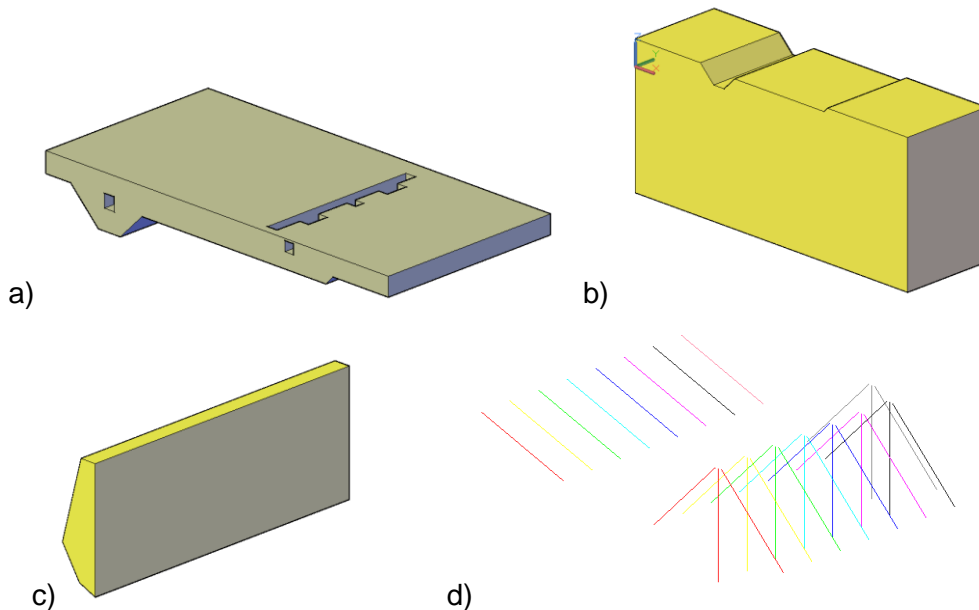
Representation of the FEM model elements: a) foundation joint of the additional hydropower plant; b) rock mass; c) injection curtain; d) drainage boreholes [2]
